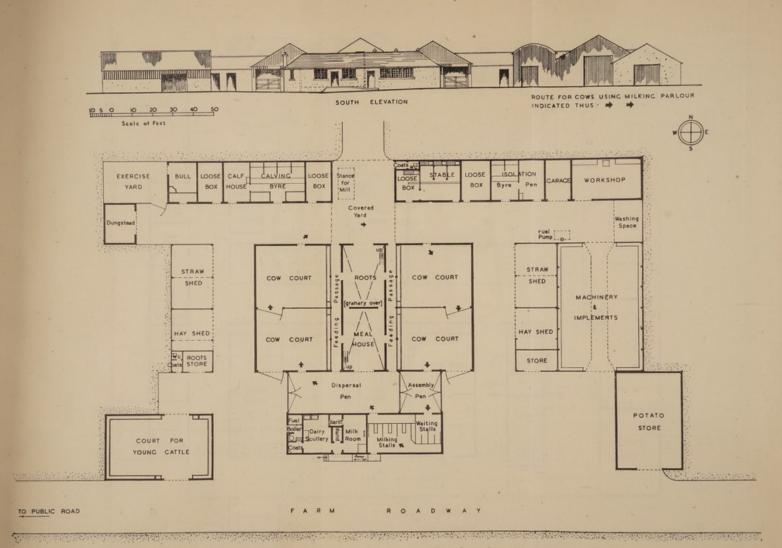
Plan F. Steading for Mixed Arable and Dairy Farm (Cow Court System) for 200 to 250 Acres (See paragraph 56)
